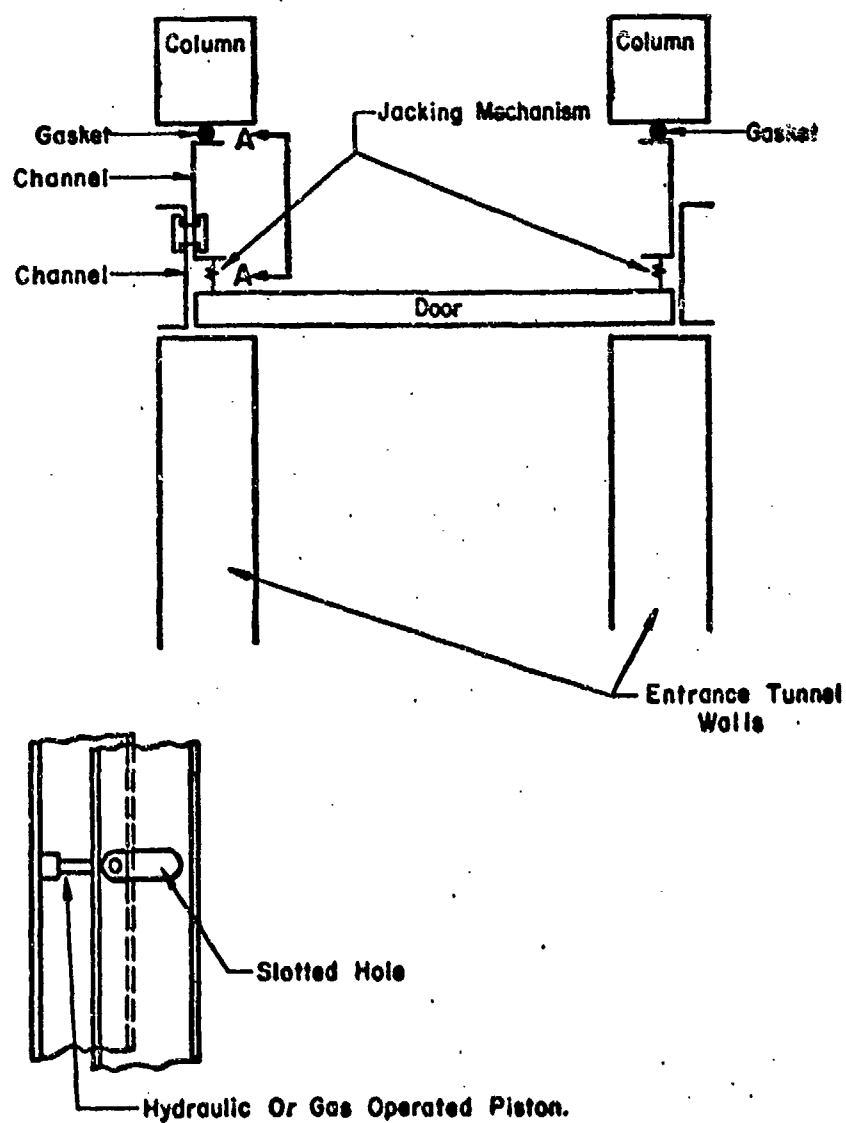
SLIDING DOOR CONFIGURATION FOR DOOR INSIDE SHELTER
